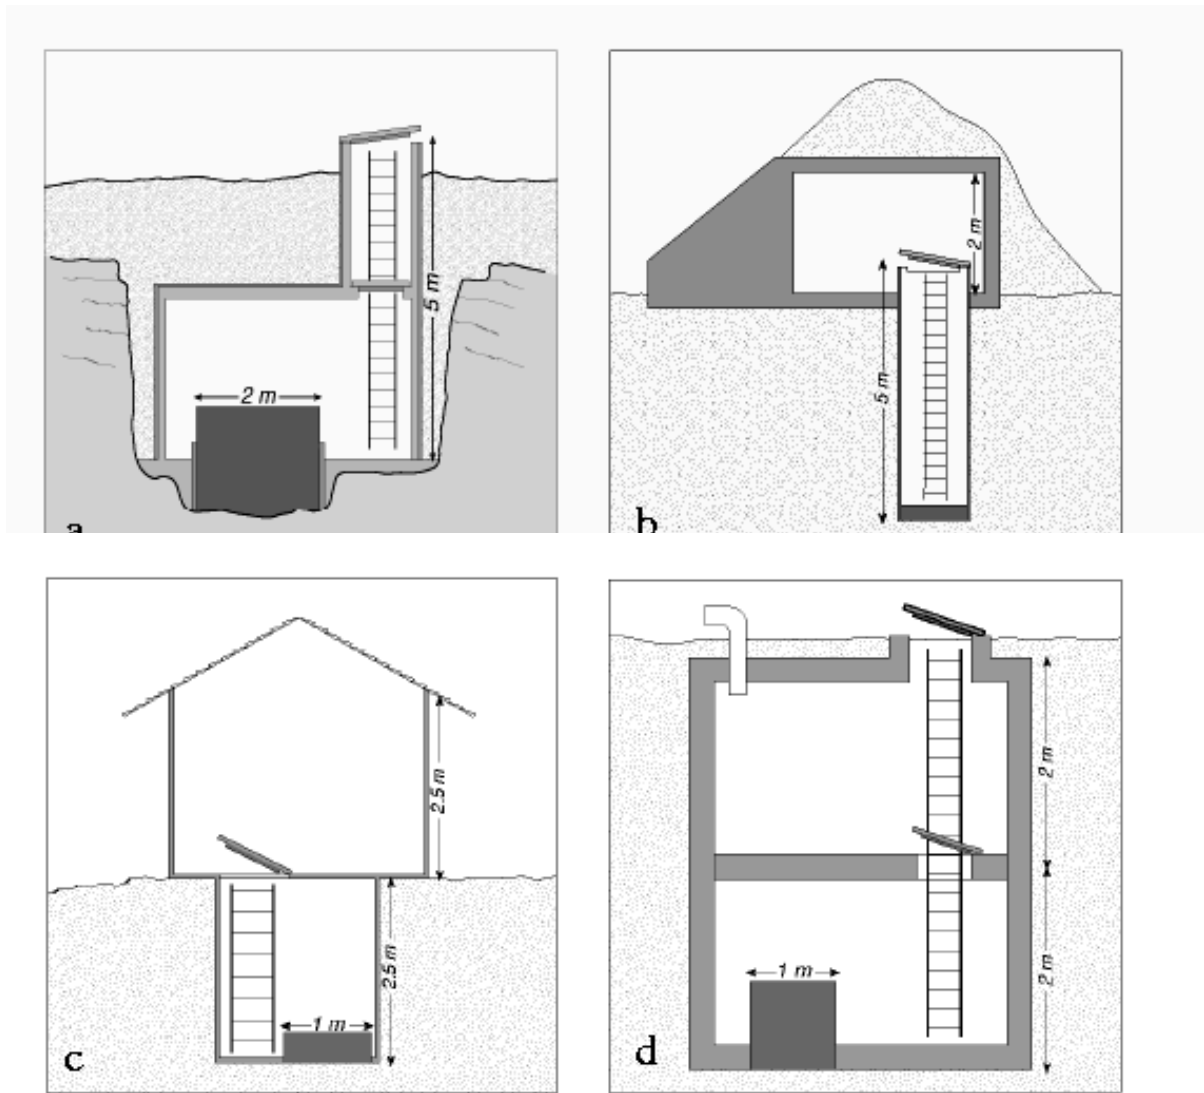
a) Underground bunker vault construction for the installation of a set of STS1/VBB (remote recording); b) "wide & shallow borehole" vault construction for the installation of an STS2; c) and d) simple bunker vault construction schemes for an STS2. The vault constructions b - d allow onsite data recording thanks to the existence of a separate recording room.
